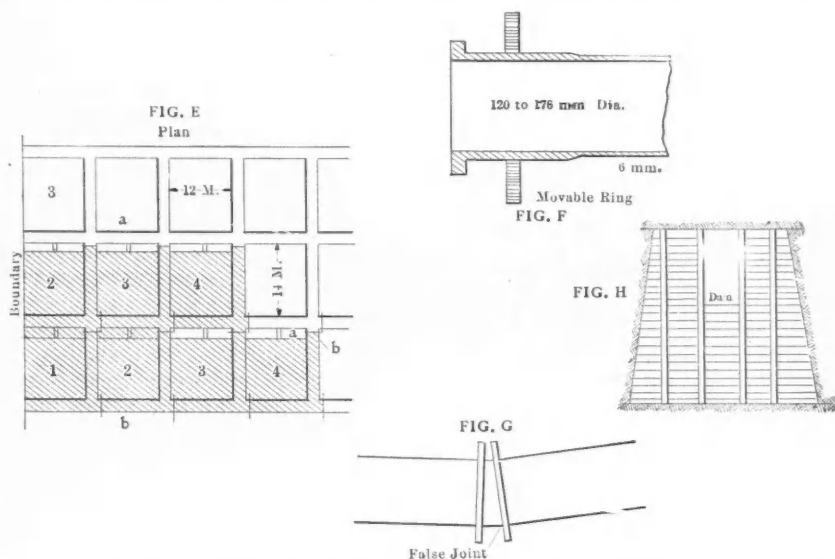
SHOWING PIPES AND ARRANGEMENT OF DAM USED IN UNDERGROUND FILLING
